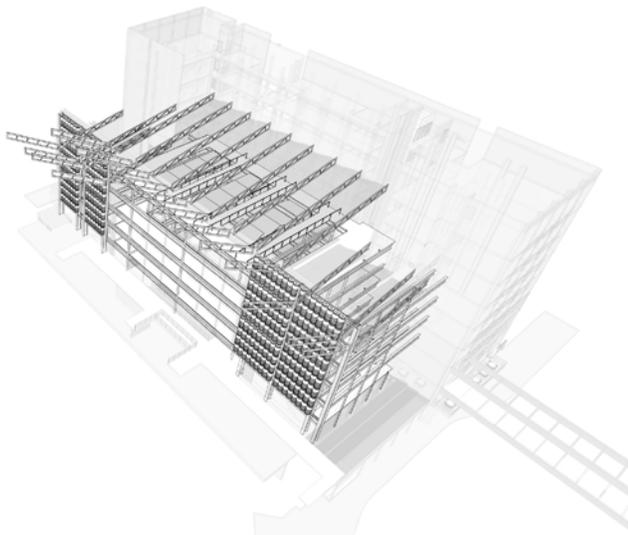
Secondary structure plus floors: horizontal trusses tie the primary structure to the columns of the existing Govpret building. Floors provide stability for the secondary structure.
